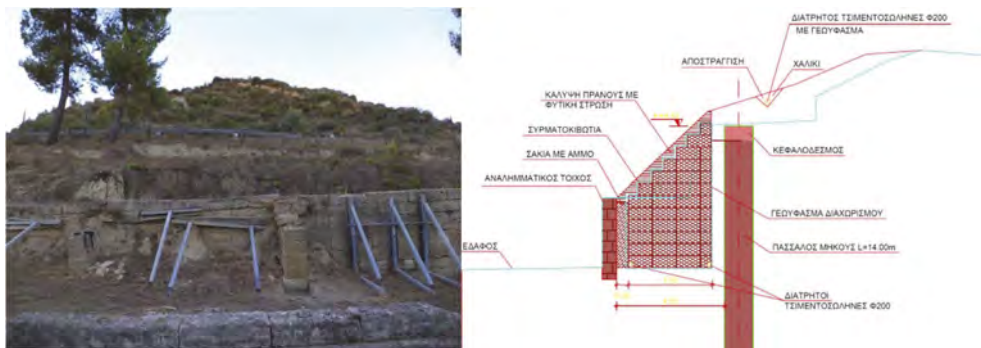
(a) Photo of the Treasures Retaining Wall. (b) Final phase of the restoration measures behind the ancient retaining wall.
